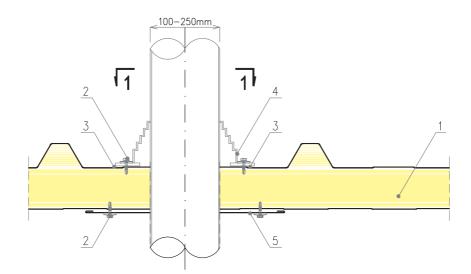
IzoRoof PIR/PIR+; MWF; EPS - roof penetration
